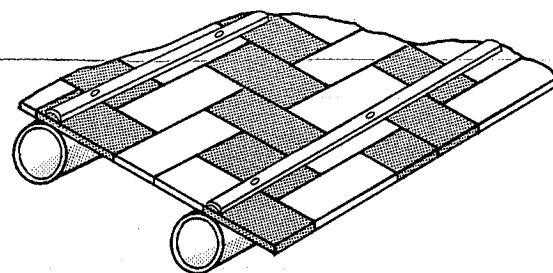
Woven bamboo mat floor decking (after Janssen, 1995)
